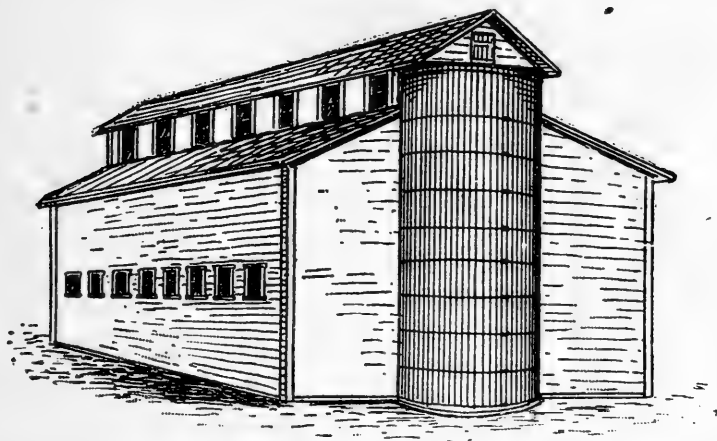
STAVE SILO BUILT IN CONNECTION WITH A CHEAP AND EFFECTIVE DAIRY BARN. (ELIAS.)
